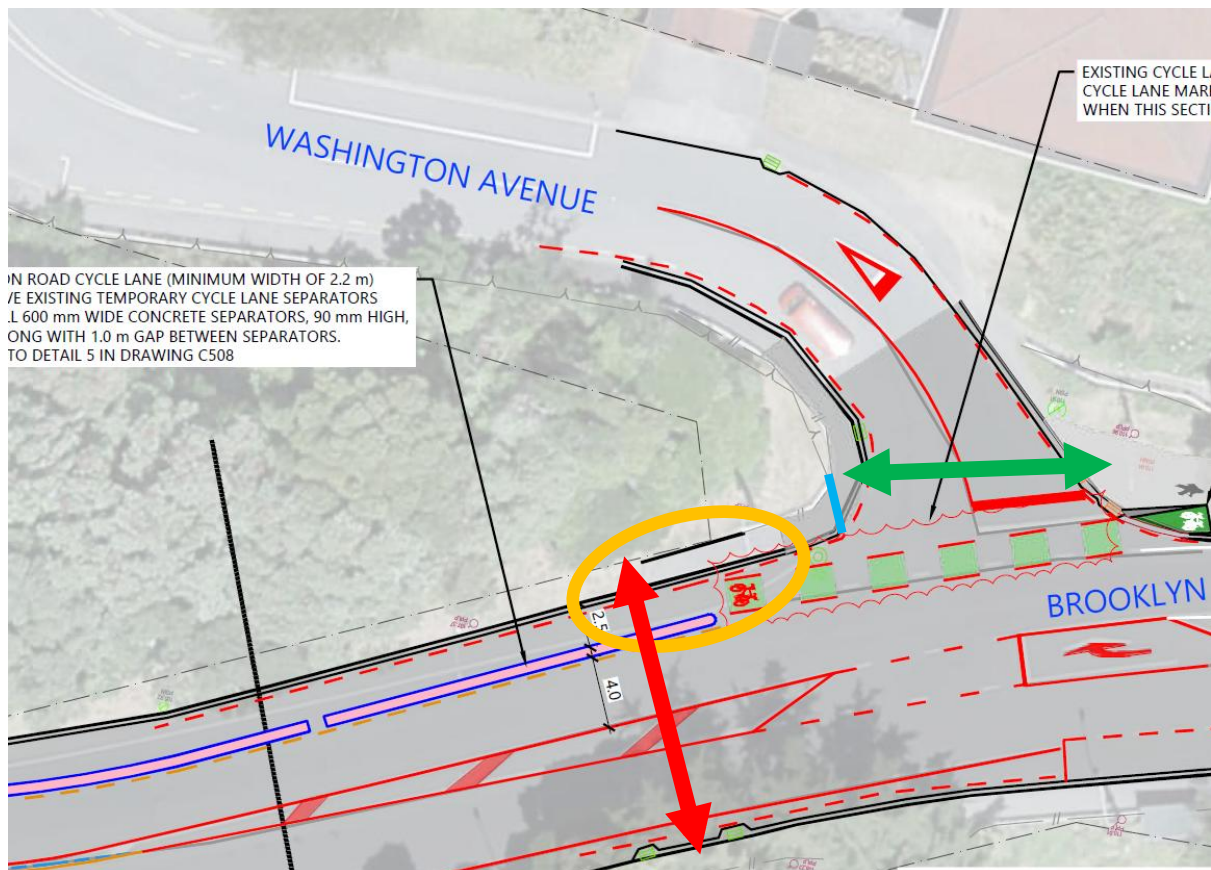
Drawing Sheet C303 - Pedestrian Facilities at Brooklyn Road & Washington Avenue Intersection
